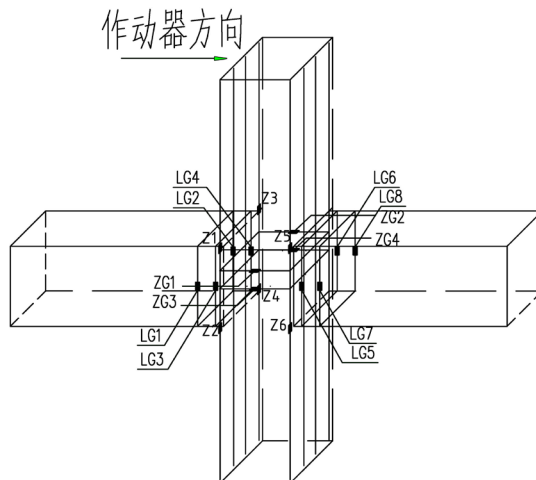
Beam stirrup, column longitudinal reinforcement, stirrups strain gauge layout
